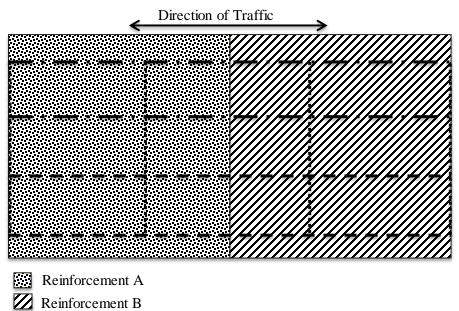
Plan view of proposed specimen illustrating the location of different reinforcement type and steel coating (preliminary and subject to review/approval by the project panel)
